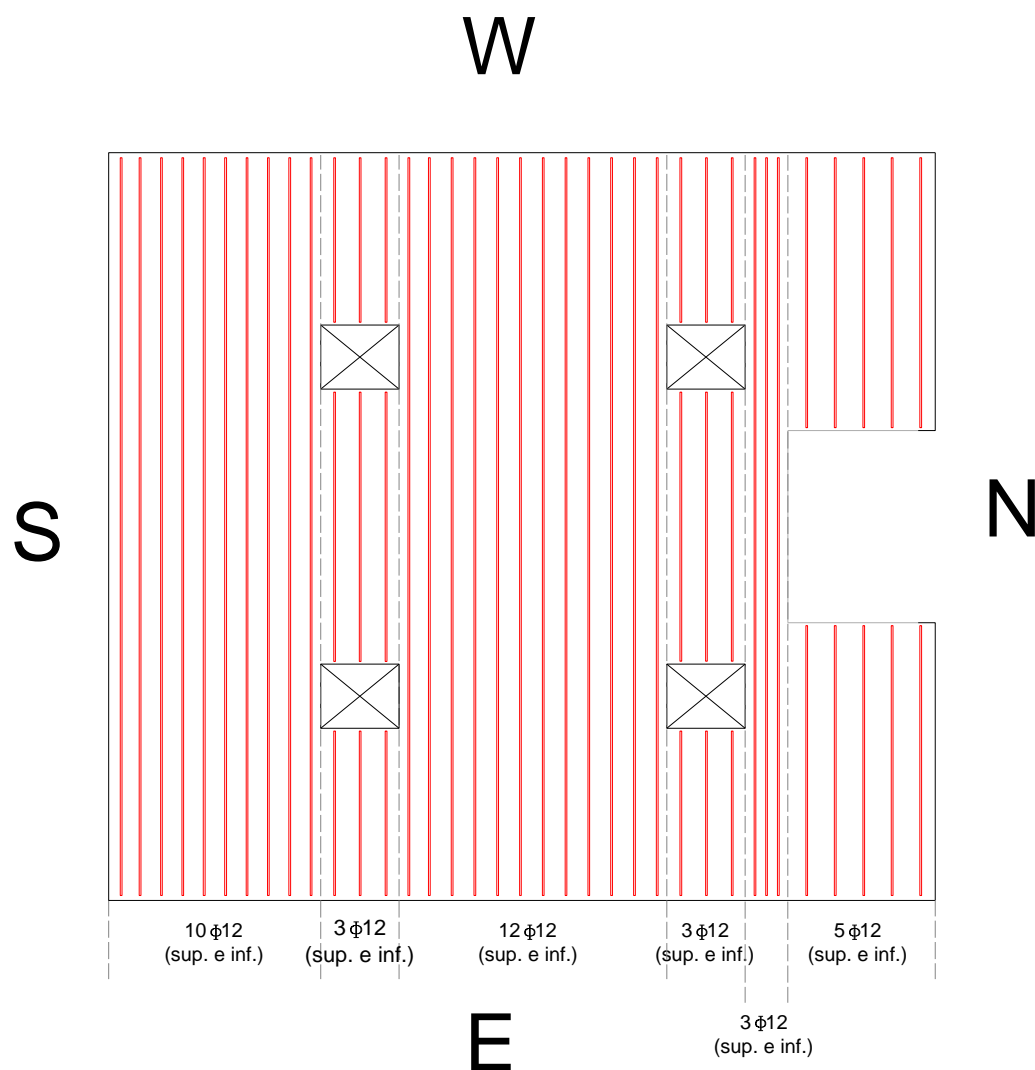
Reinforced concrete slab: East-West top and bottom reinforcement plan view.
